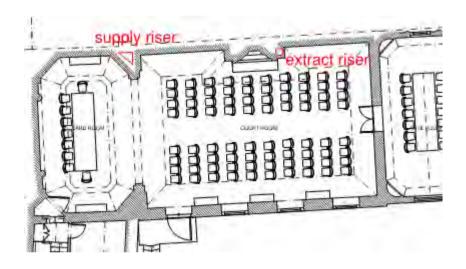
First Floor Court Room and Card Room showing riser approx locations (red)
